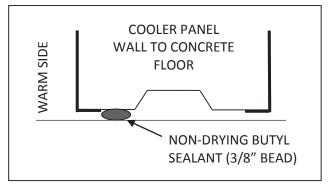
COOLER PANEL TO CONCRETE FLOOR
